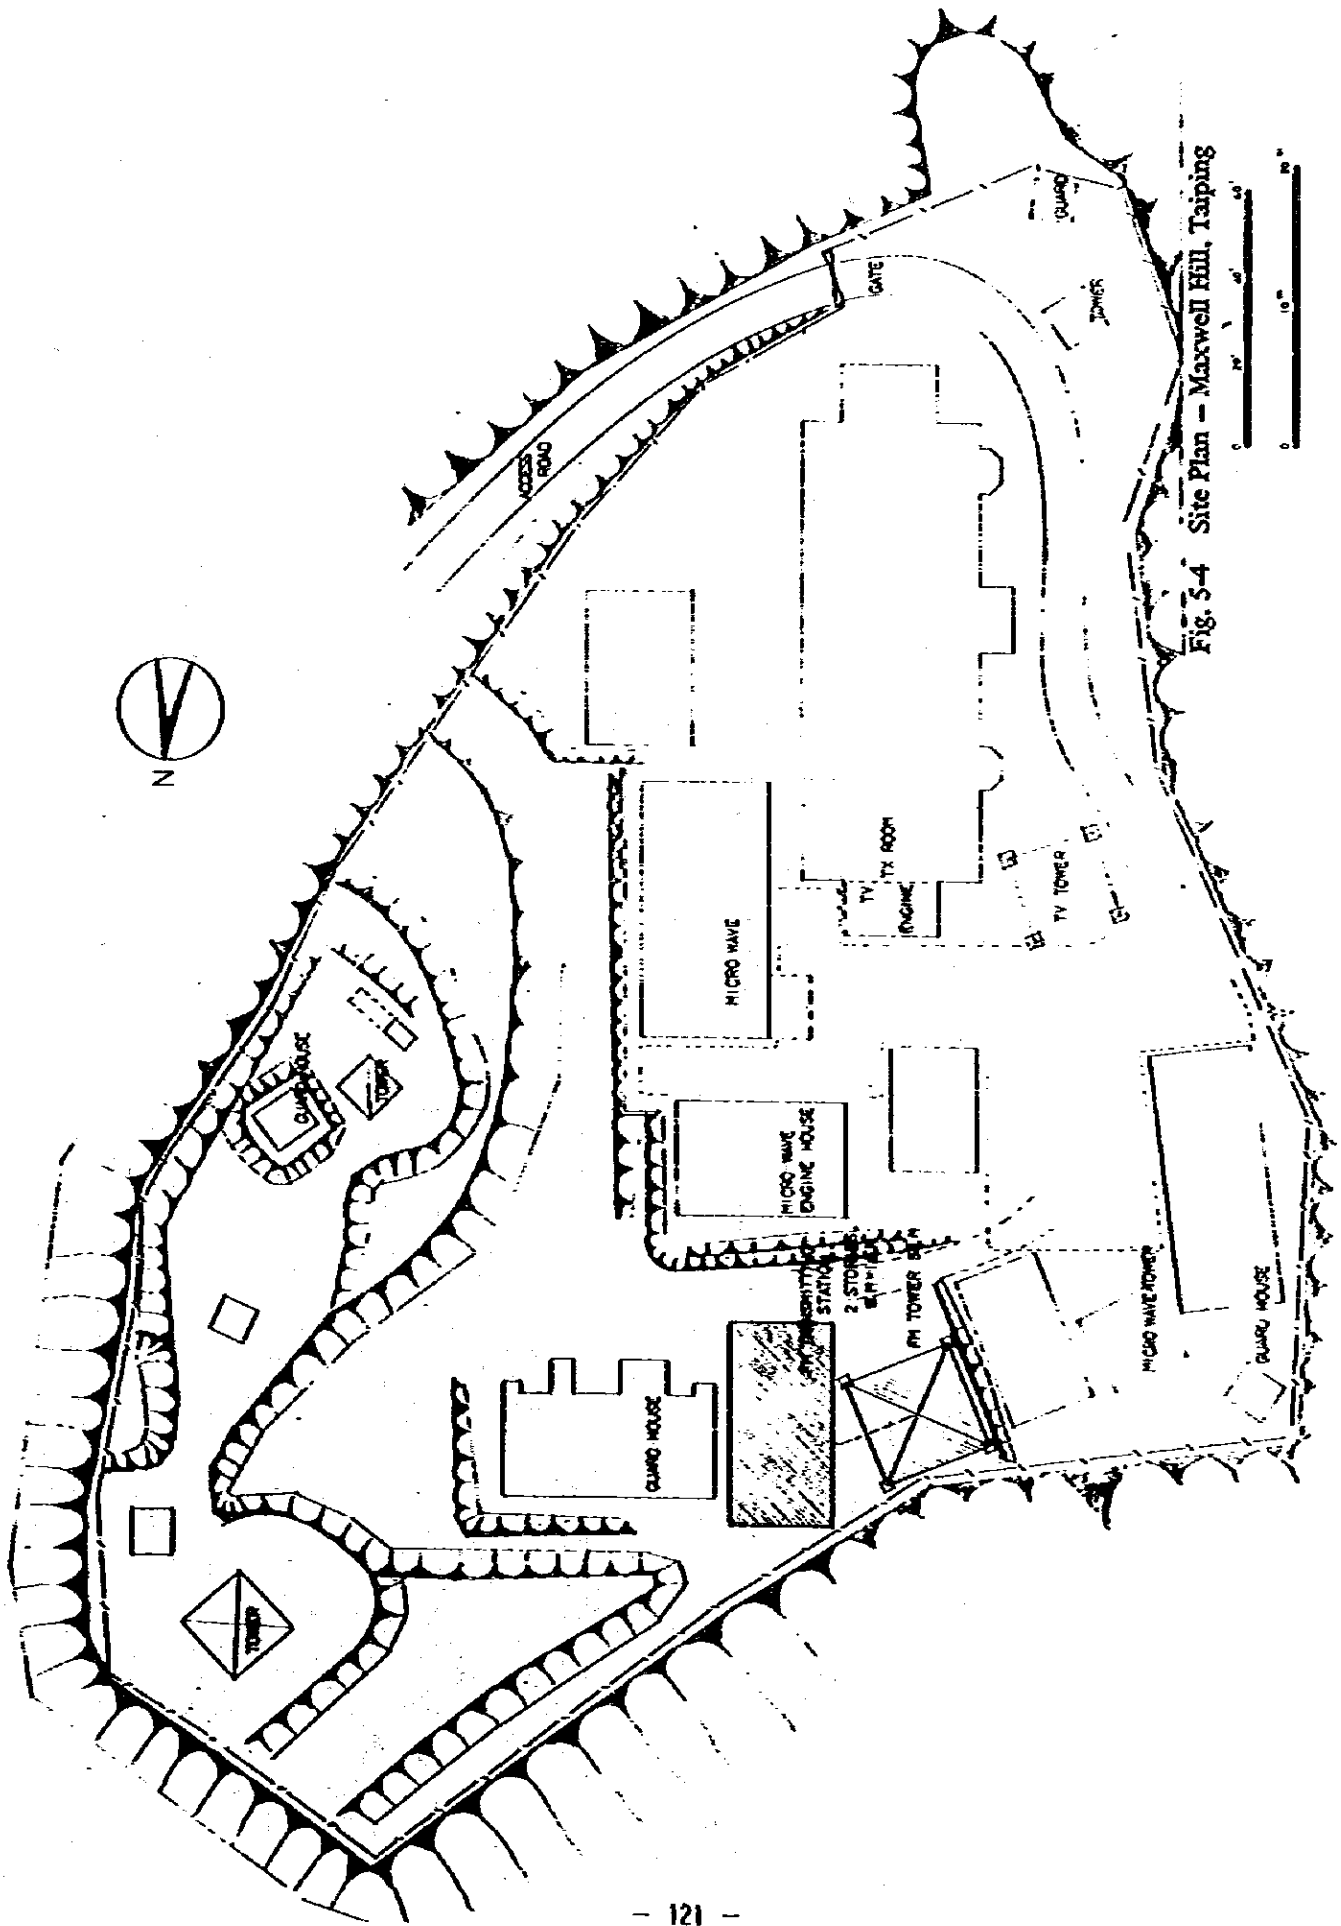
Site Plan - Maxwell Hill, Tarping
